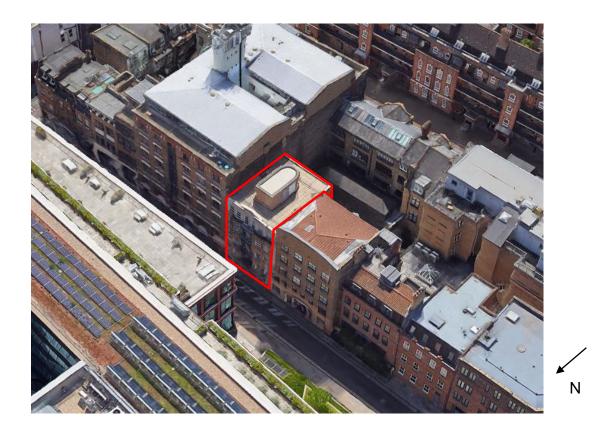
Aerial photograph of the Site, view of the northern Whites Row elevation
